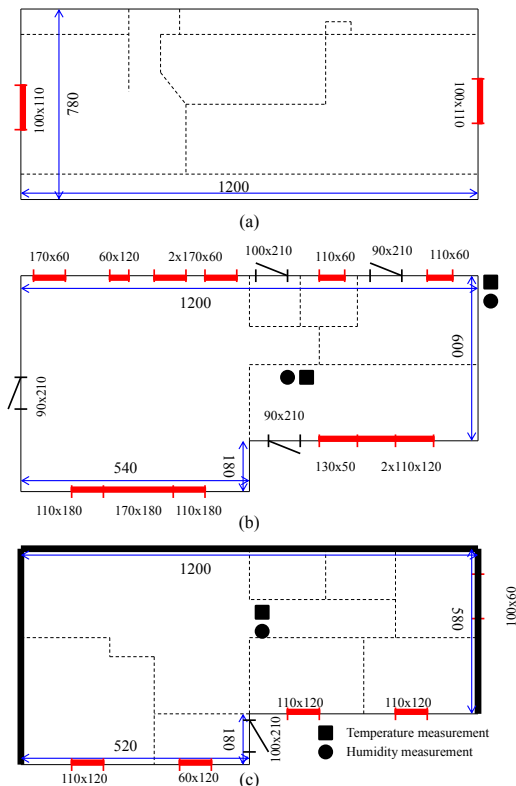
Sketches with the inner dimensions of the test building (a) second floor (attic) (b) first floor (main floor) (c) basement. All the dimensions are in cm.
